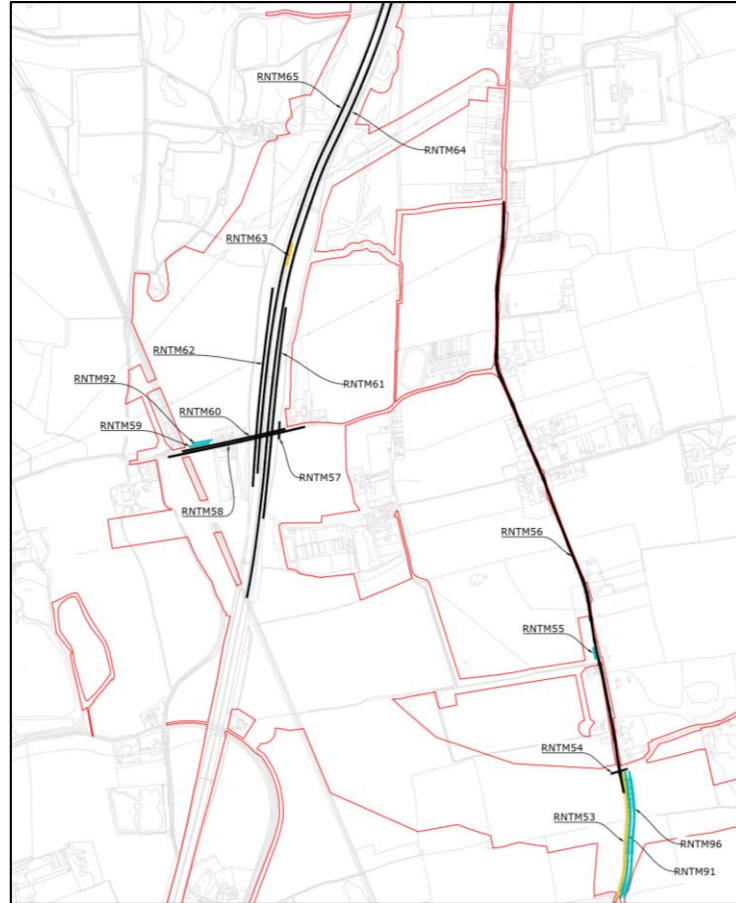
Roads North traffic management measures location plan (8 of 8)
